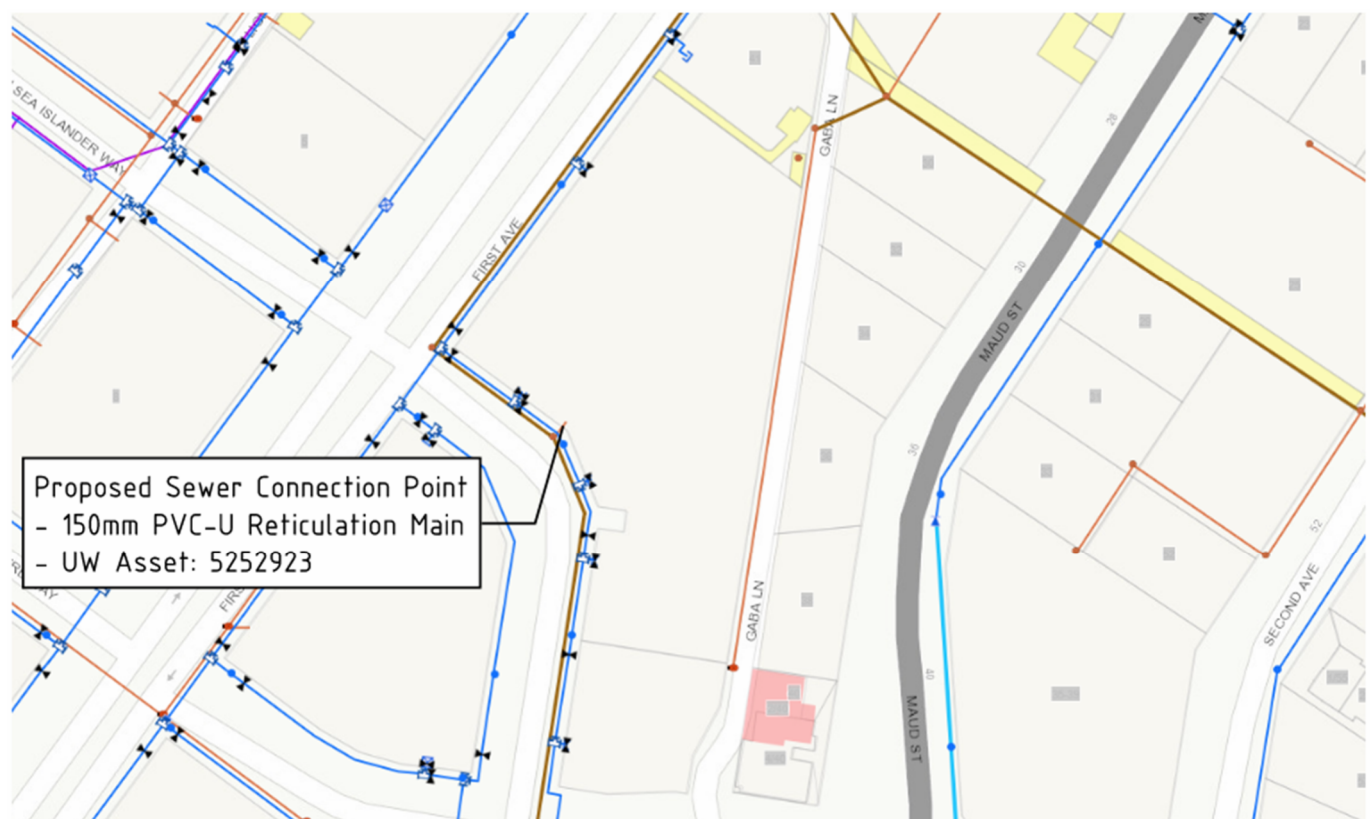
Sewer Connection to Site (Unitywater Mapping)
